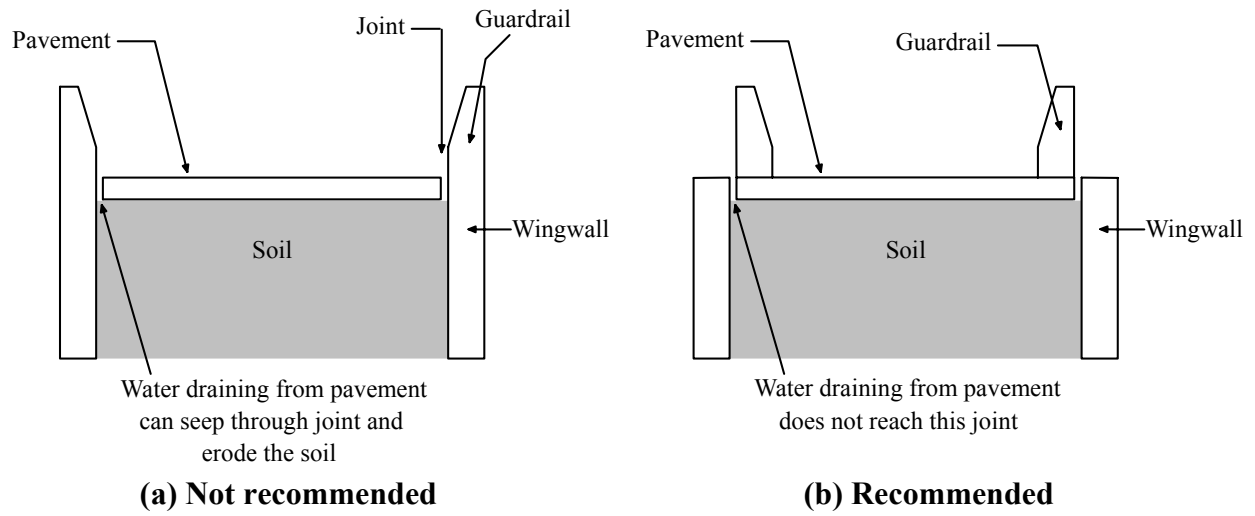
Recommended wingwall detail (Briaud et al. 1997)
